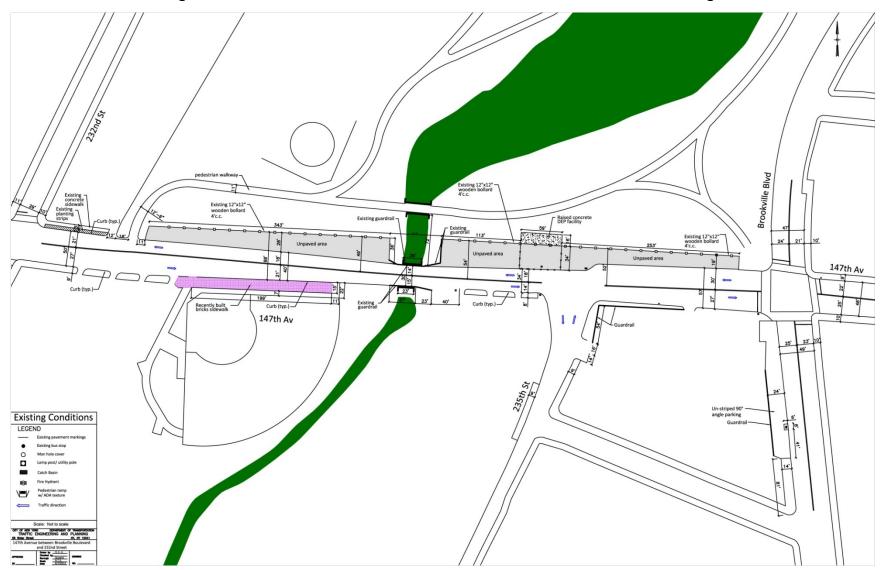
147th Avenue between Brookville Boulevard & 232nd Street – Existing
